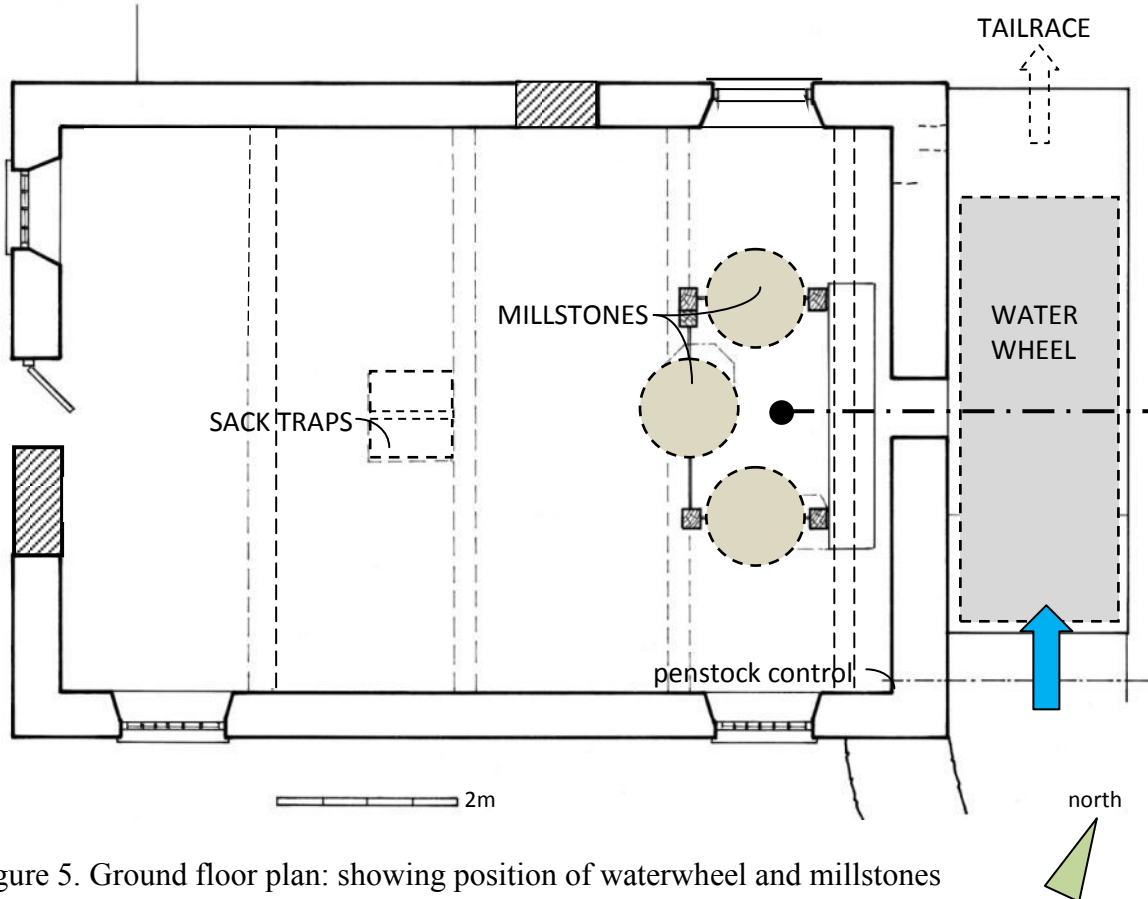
Ground floor plan: showing position of waterwheel and millstones
